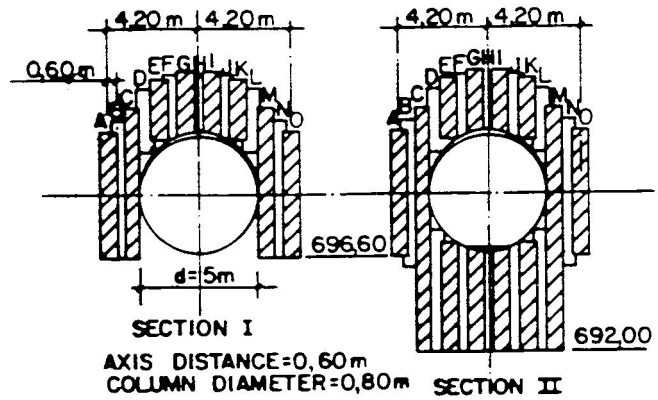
Tiete Tunnel Typical Pre Support Geometry
